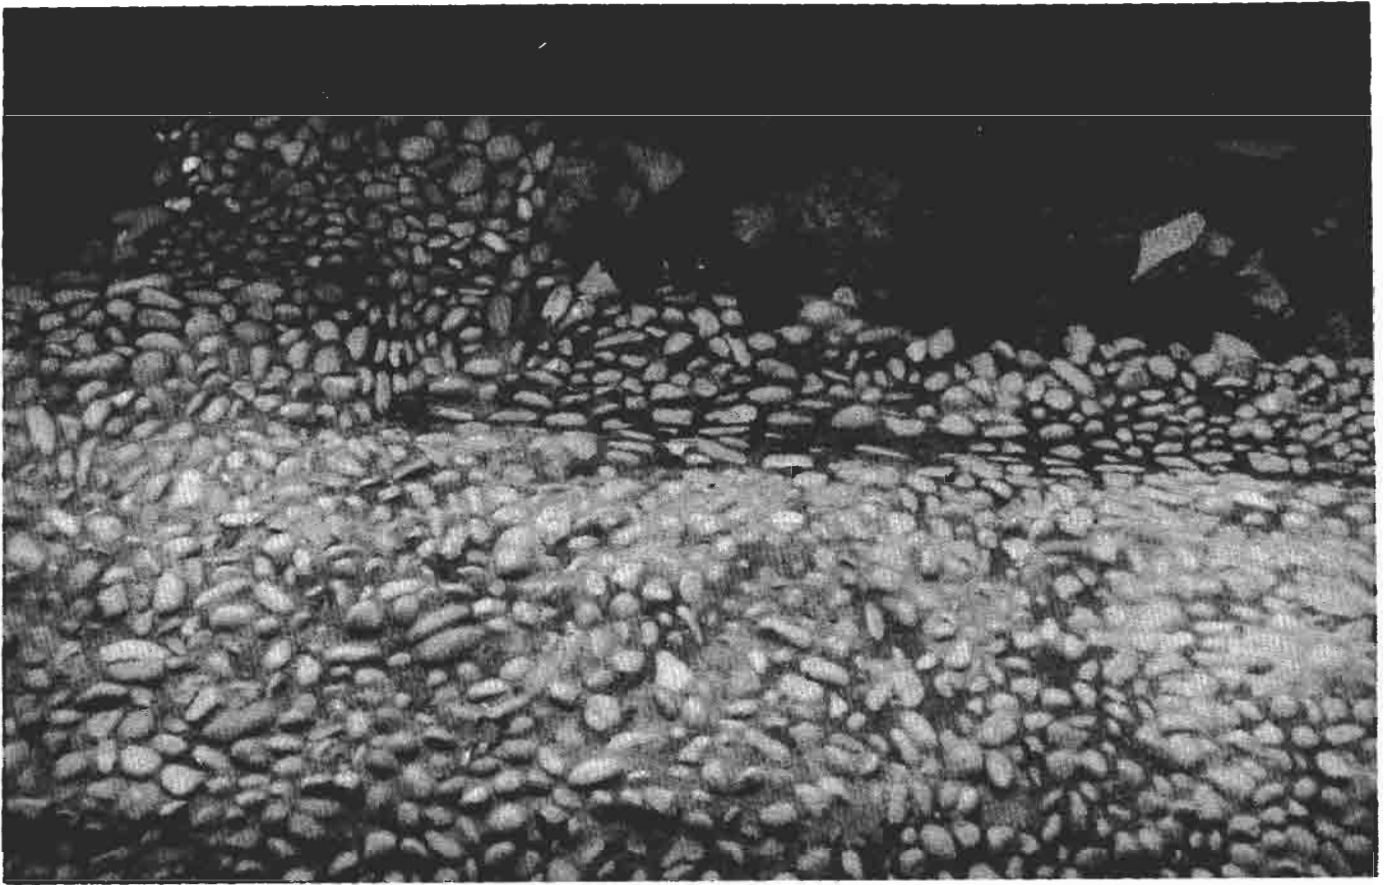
Operation 3 showing cobble drains, southeast corner of first period lean-to foundation, and cobbles going under later lean-to foundation.
